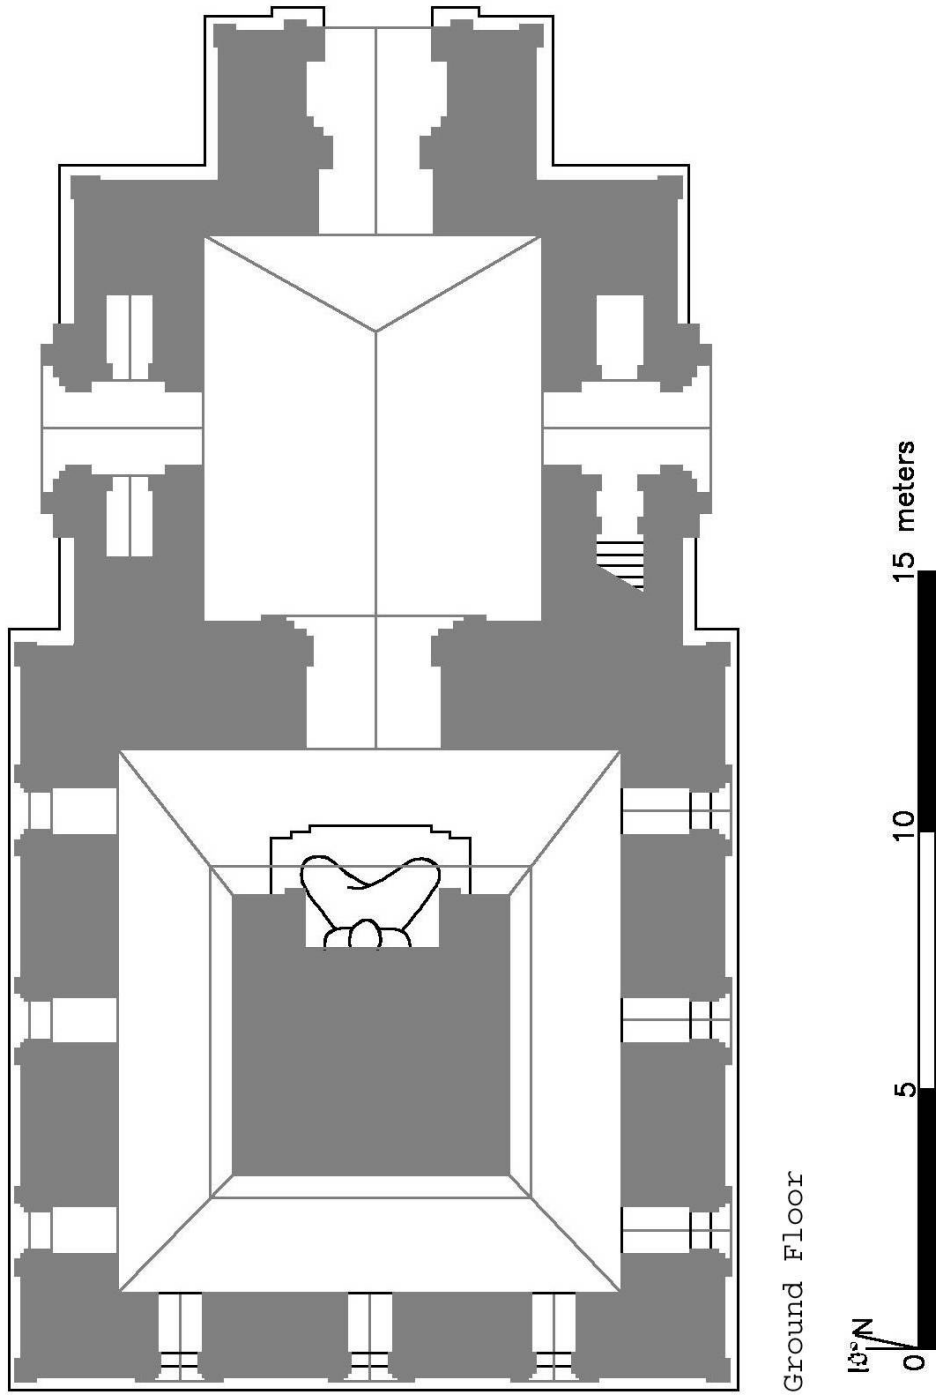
Ground Floor Plan of Hlaingshe (Monument 369)
